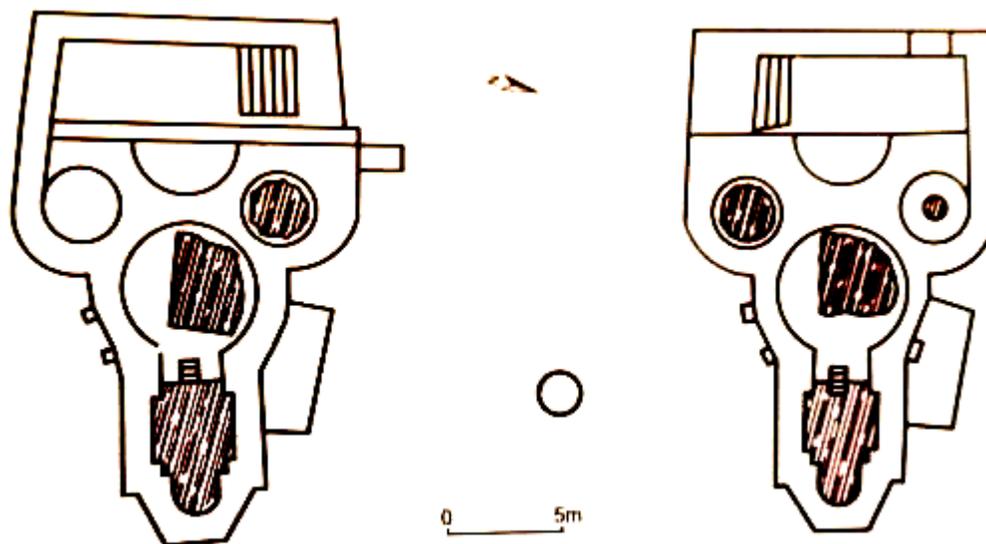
Plan of "ring" shaped buildings. (F.Peja, B. Rraci, A. Hajdari: Castle of Harlilaq, 2012)
